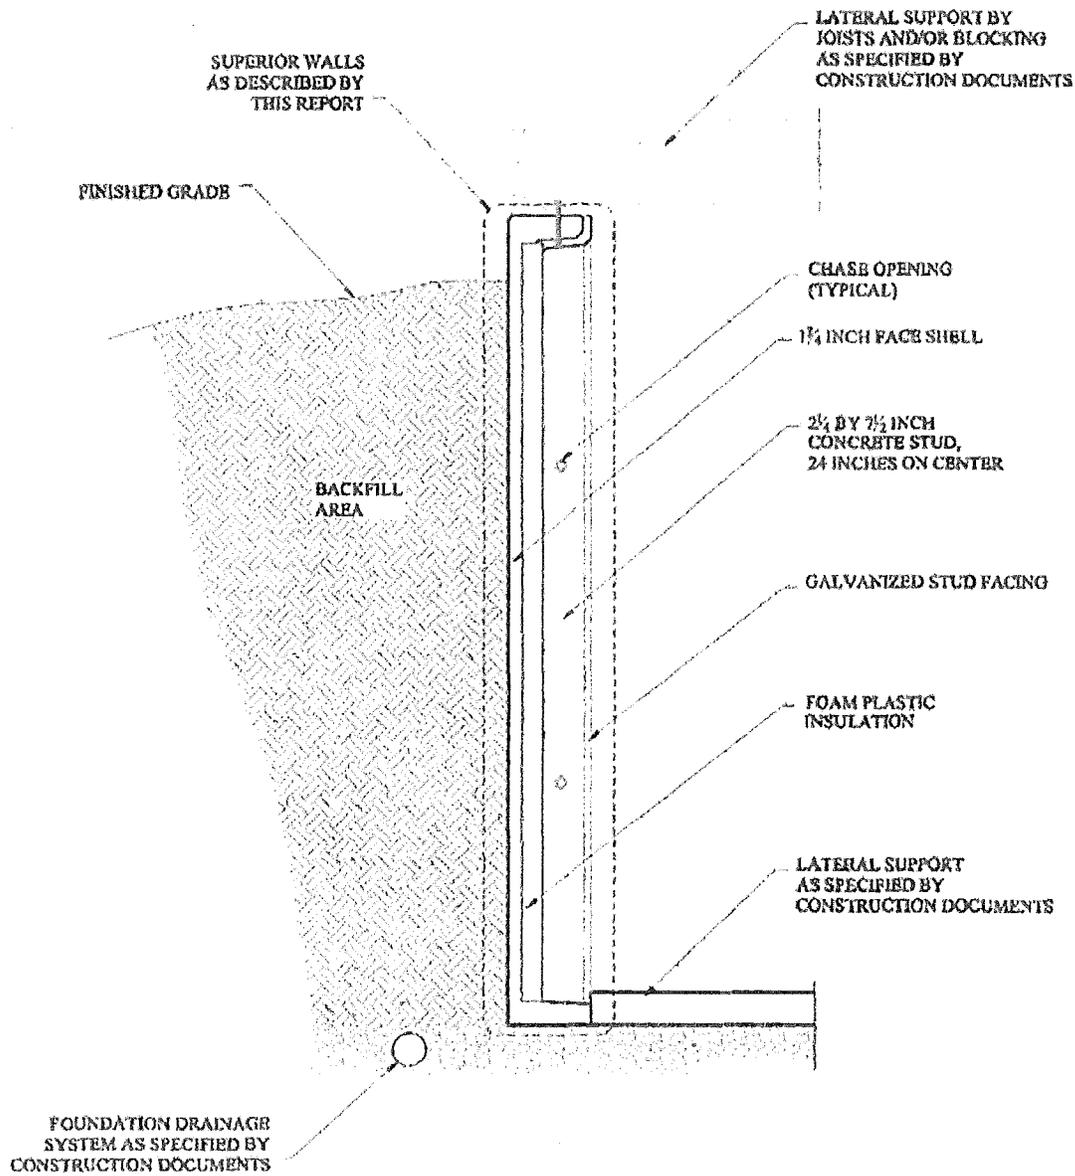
TYPICAL SUPERIOR WALL VERTICAL SECTION DETAIL
